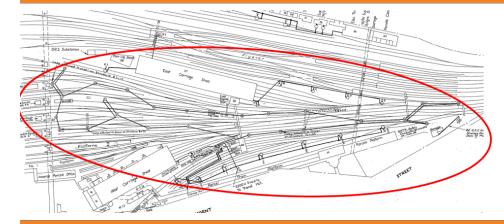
1953 lighting plan of Sydney Yard, showing the electrical conduits. Source: Sydney Trains VPR
